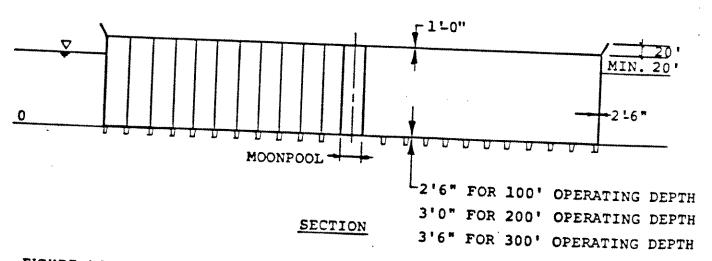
TYPICAL STRUCTURAL ARRANGEMENT OF EXPLORATION MONOLITHIC CAISSON
